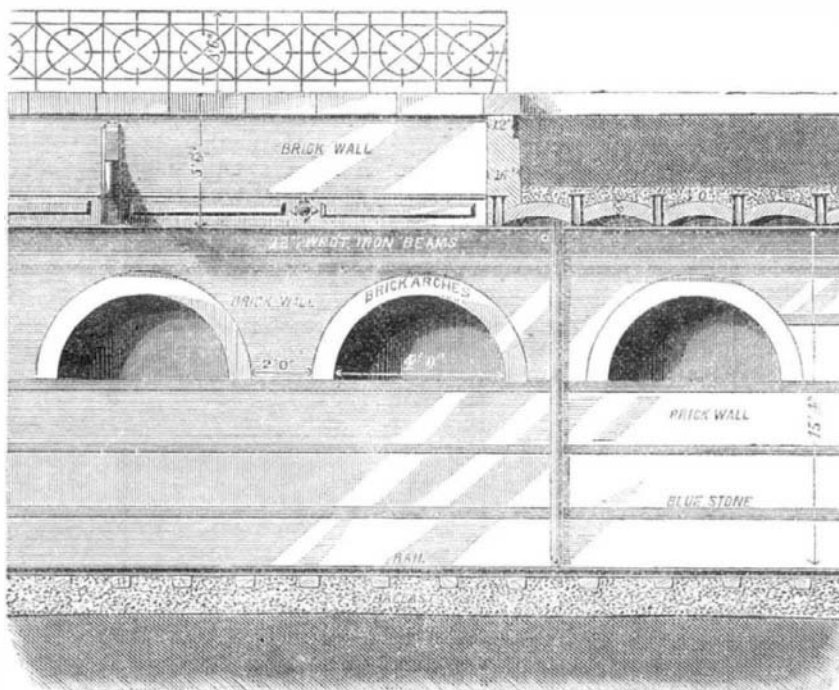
THE UNDERGROUND RAILWAY, NEW YORK CITY.—LONGITUDINAL SECTIONAL ELEVATION OF THE BEAM TUNNELS.—59TH TO 76TH STREETS.
